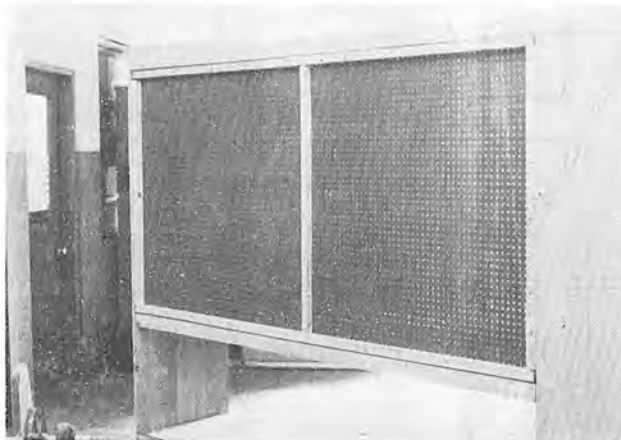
Rear view showing pegboard framed with 2 by 2's
